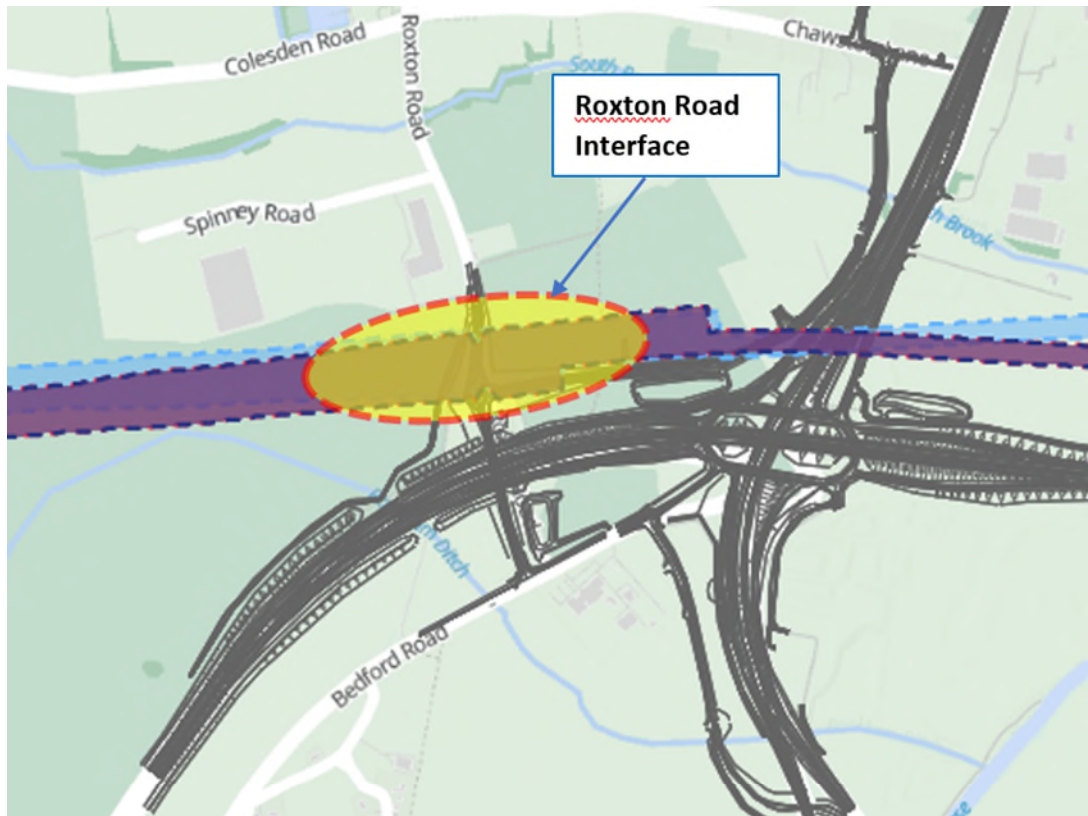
Potential engineering interaction location between the Scheme and EWR Project Alignments 1, 2 and 6 at Roxton Road
